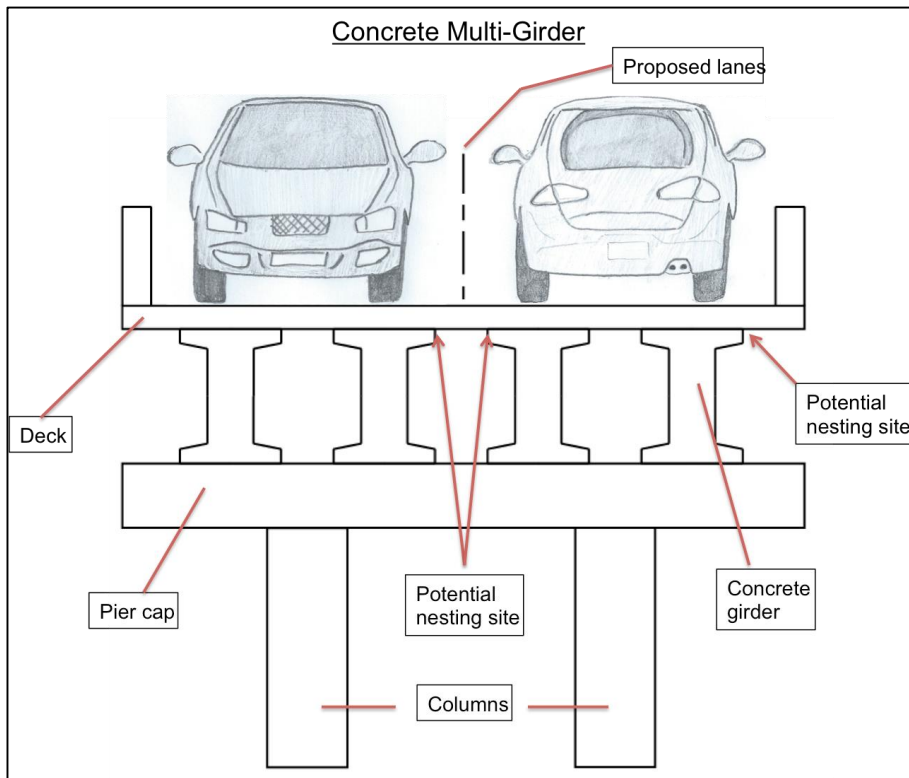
Cross-section view of a concrete multi-girder bridge with potential nesting sites
